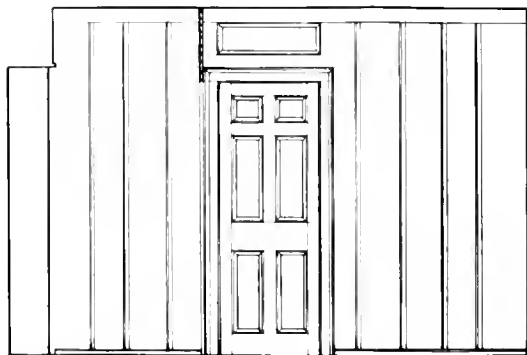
East Hall, East Elevation This is the only wall of the East Hall which is of one plane. The wall is feather board across, except adjacent to the north door to the terrace where the wall is plastered.
